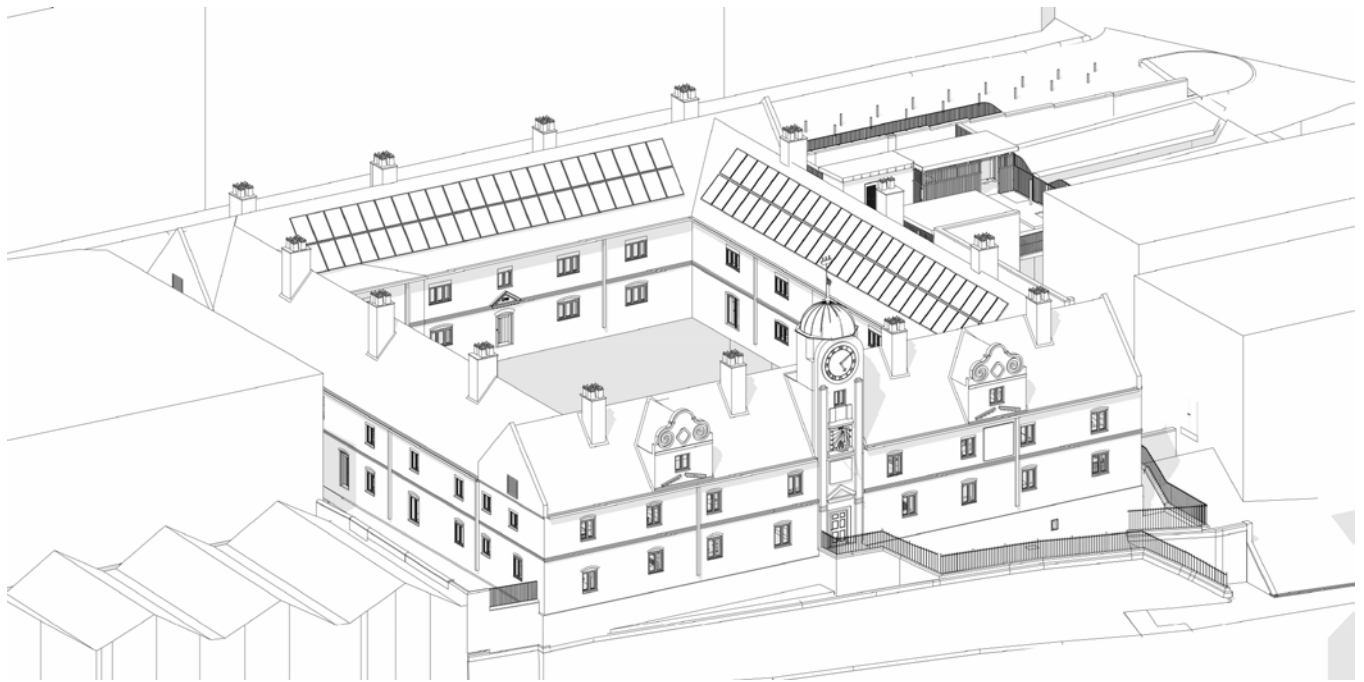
3D model view showing PV panels to internal courtyard south-east and south-west facing roof slopes © JDDK Architects Ltd.
